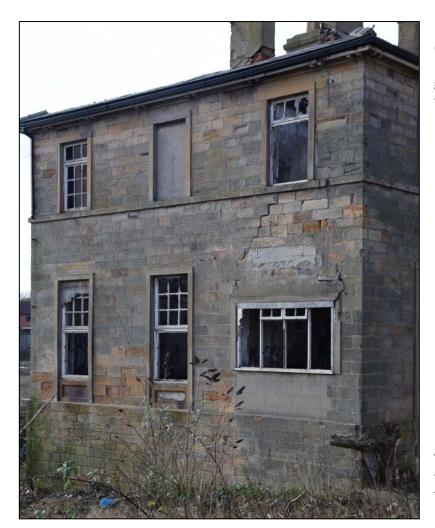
The house from the south-west. The ground level seen here is well above the former garden, which was below the lowest point visible on the south wall of the building.
